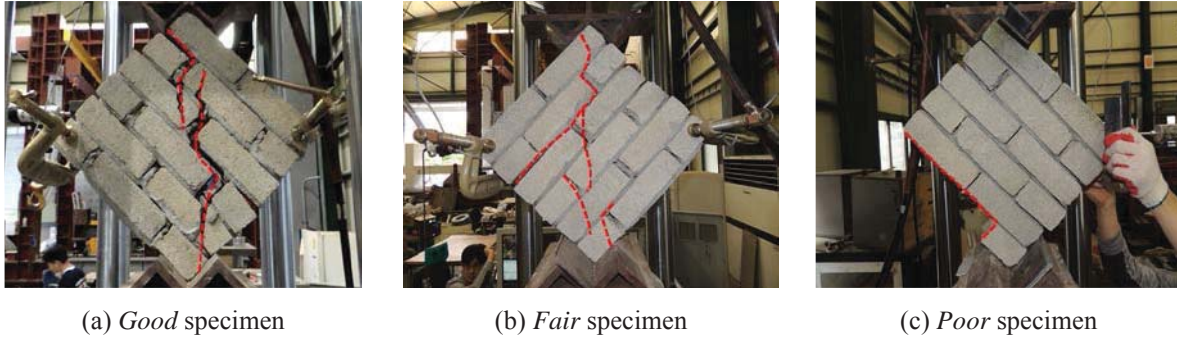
Dominant failure modes of masonry unit specimens according to construction quality
